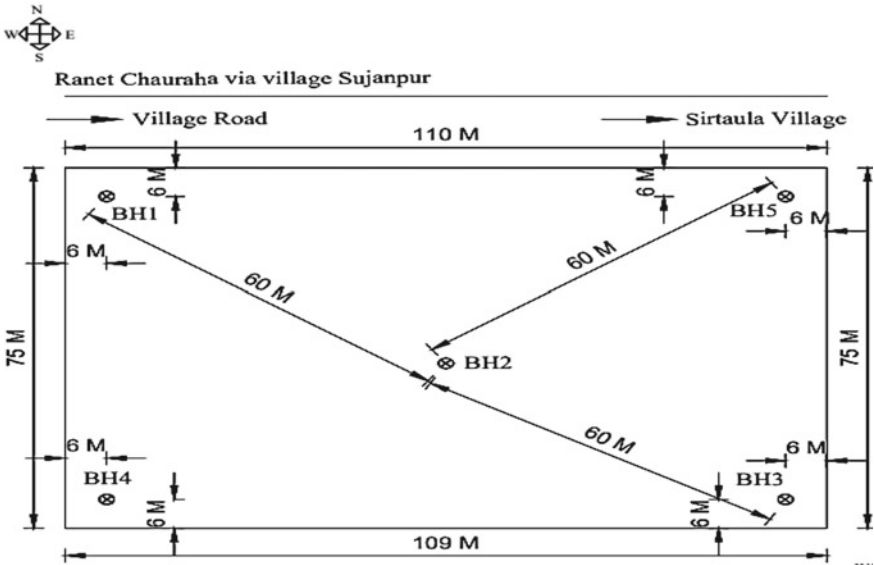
Site plan (not to scale) of proposed construction of court building at Sikandra Rao, district Hathras, Uttar Pradesh
